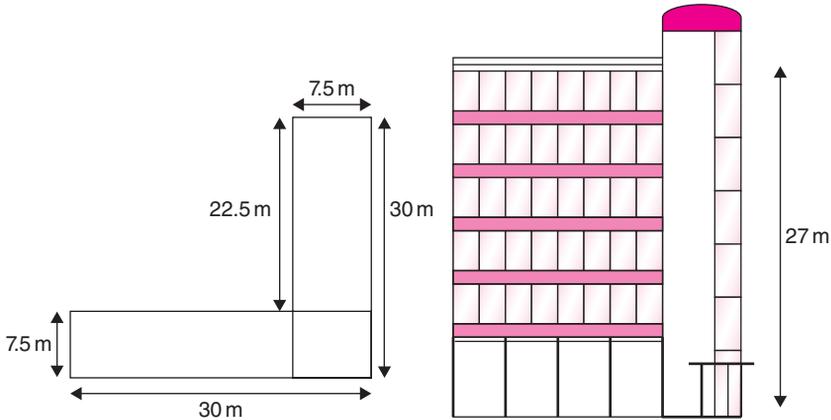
Architect's first sketch design for provincial office block (not to scale).
